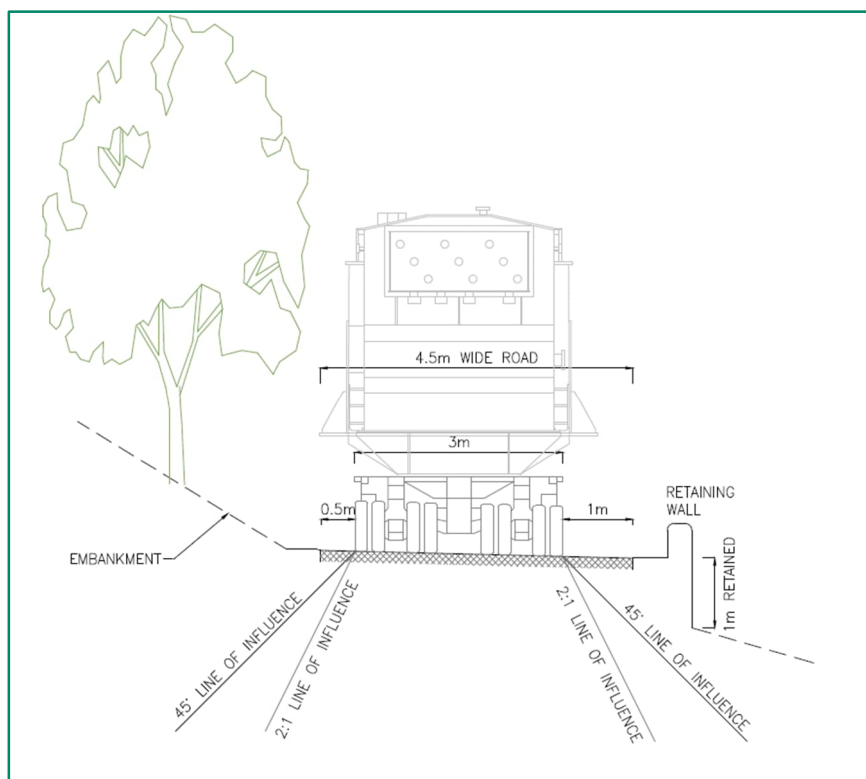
Carriageway and Retaining Wall – Typical Lines of Influence
